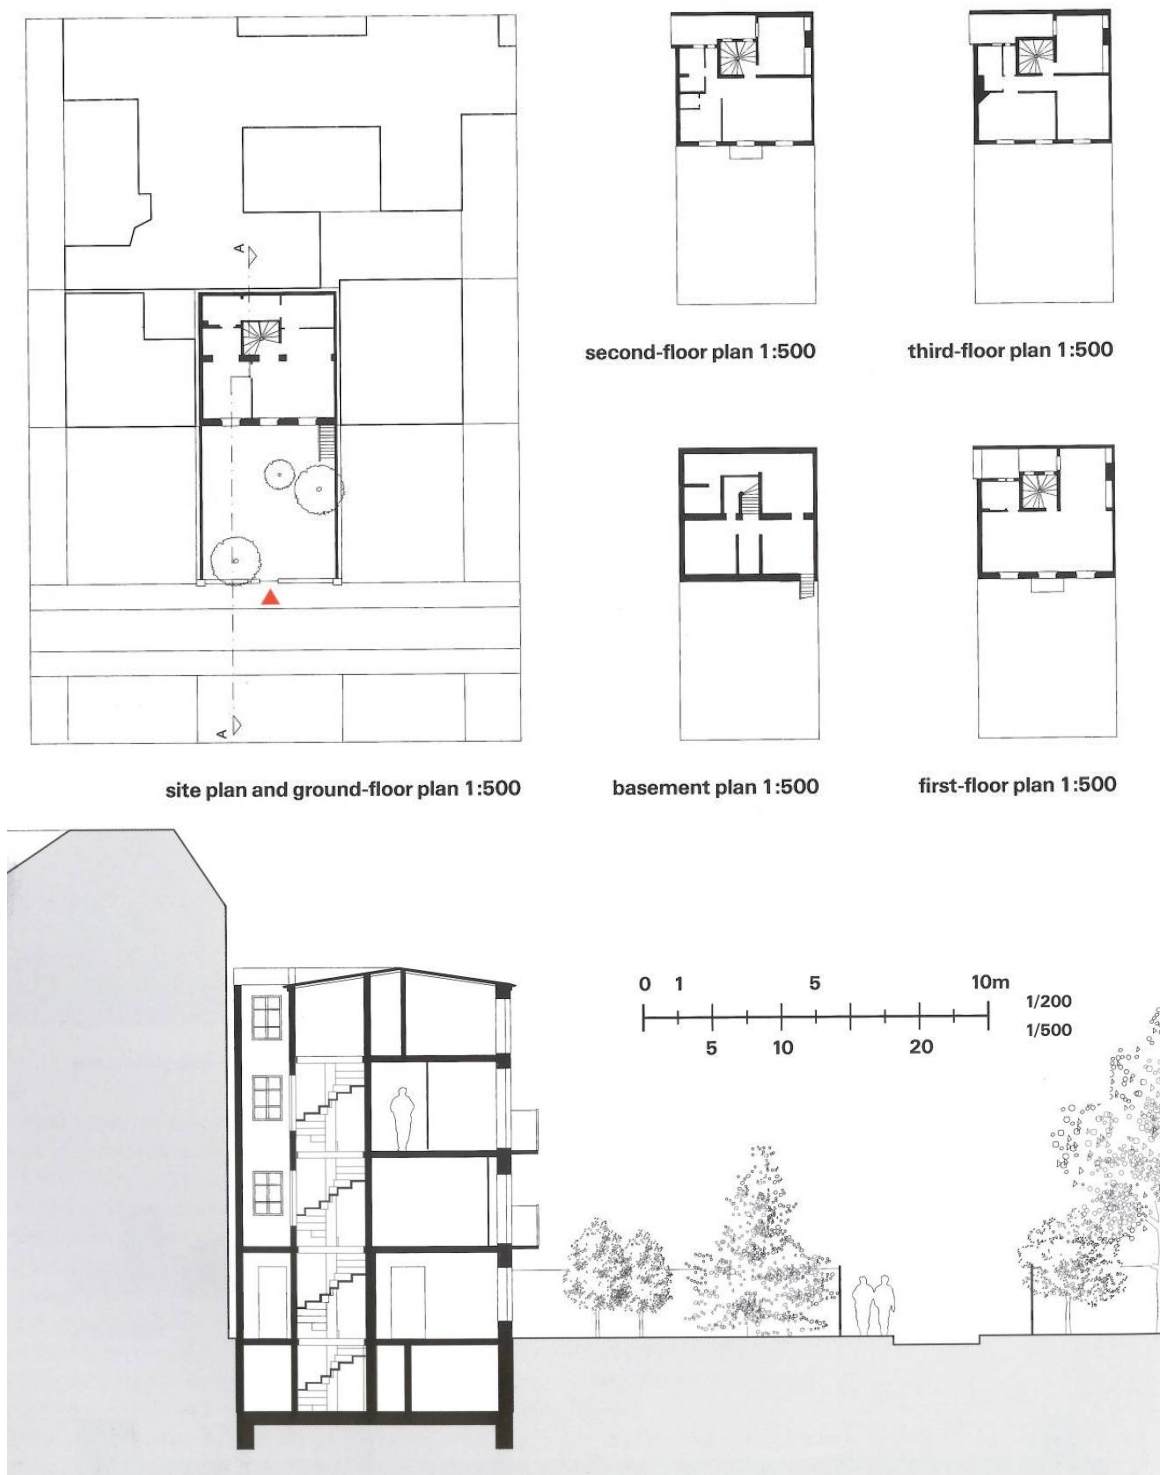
Floor plans and section for a typical front garden home in Cite' Des Fleurs, Paris. The plan features a central staircase and windows on each floor.
